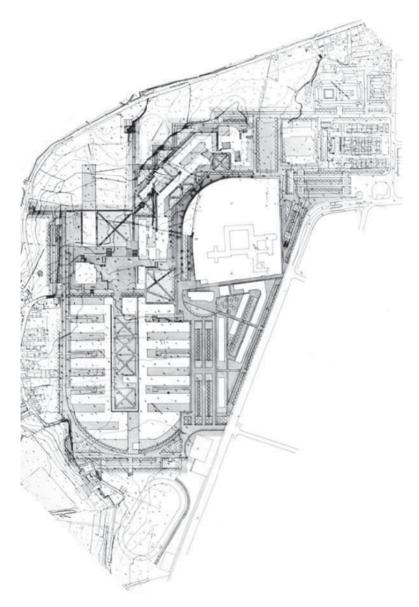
The Plan of Streets and Exterior Arrangements of the campus.³⁵ (Image courtesy of Alcino Soutinho)
